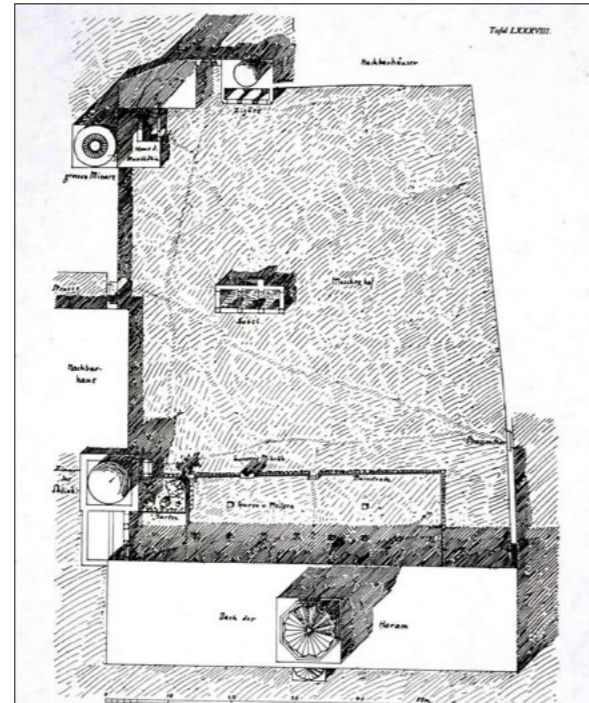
Layout plan of Al Nouri Mosque Complex and layout plan of the Prayer Hall at the beginning of the 20th century, 1920.
